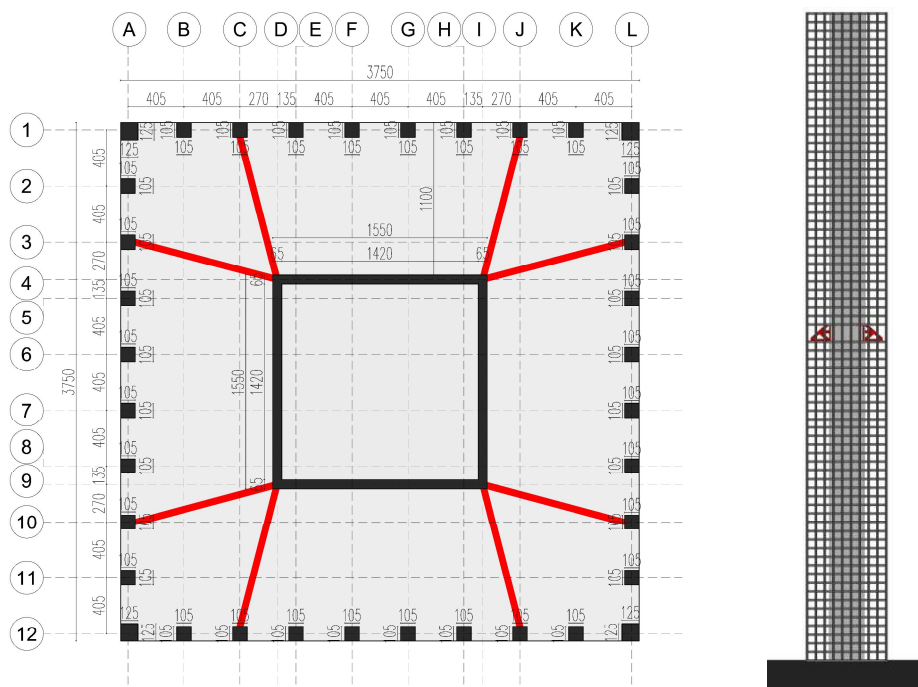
Typical floor plan and elevation of model "FT_OPT_4a"
